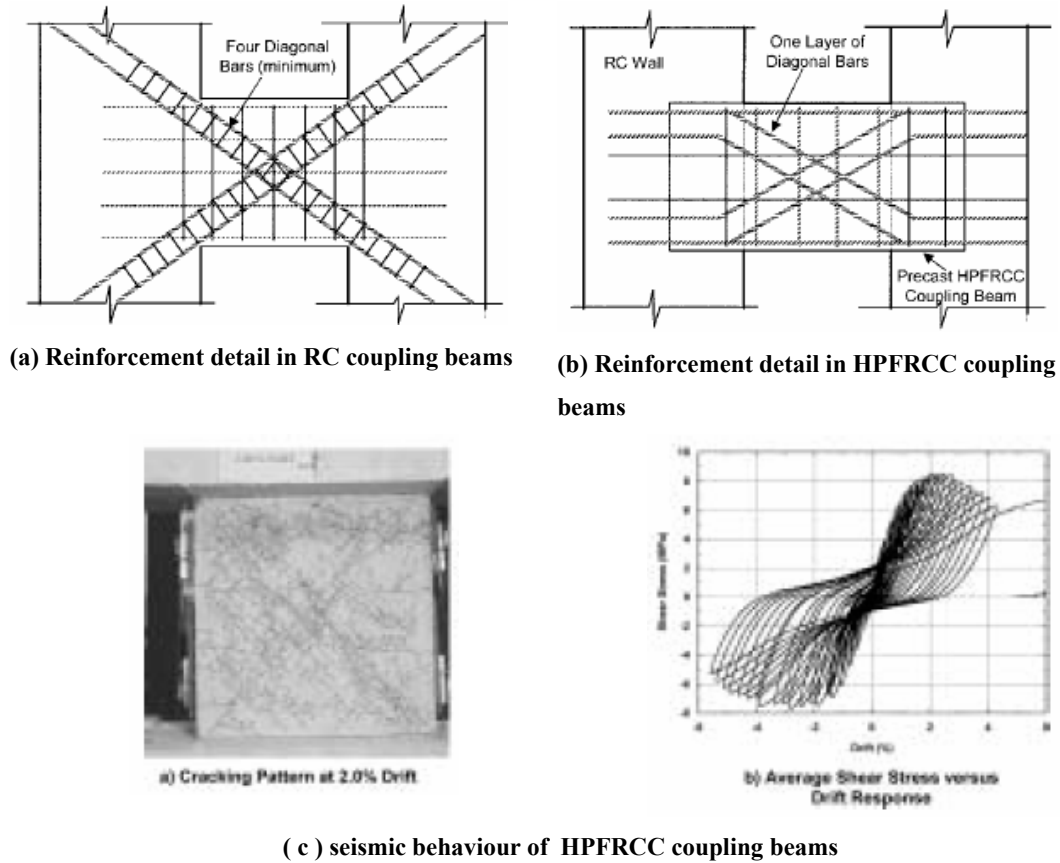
19: Reinforcement detail beams and seismic behaviour of tested coupling beams from [25]
